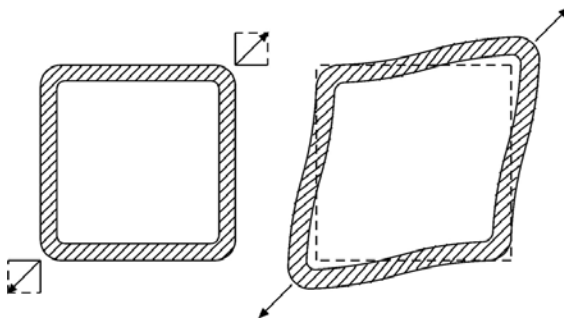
Loading causing distortion of the cross-section (on the left) and distorted member (on the right).
